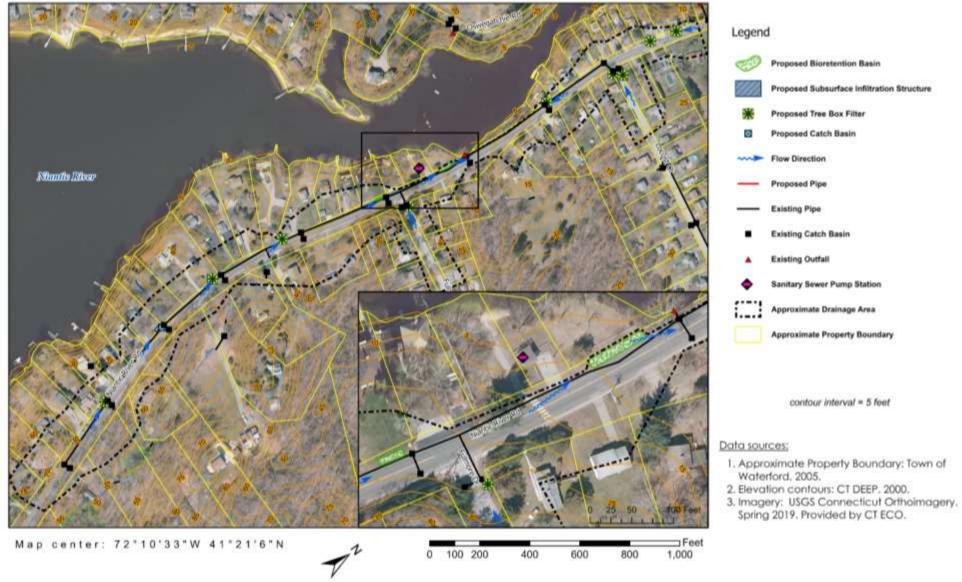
Proposed location for subsurface infiltration system along Niantic River Road, Waterford. Looking northwest.
